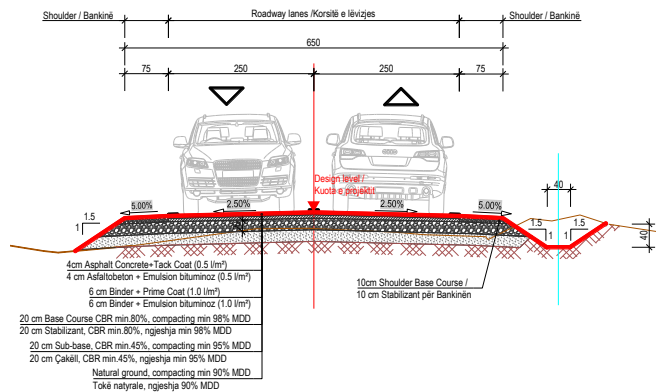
Typical Cross section No. 3 - Local Road "F2-mod" (New Rural Local Road)
